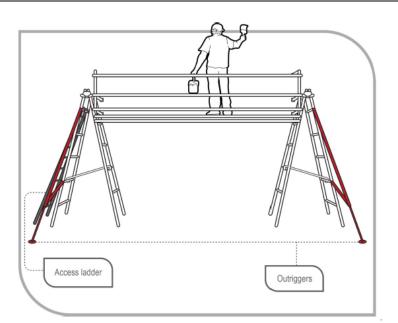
Trestle ladder scaffold with guard rails and outriggers for stability.
